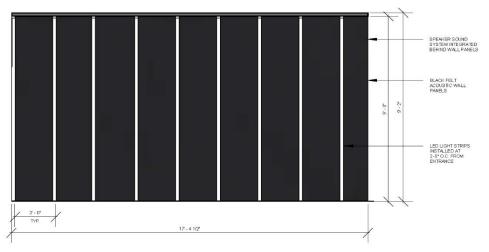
Main entrance wall elevation. Scale: 1/4'' = 1'-0''.
